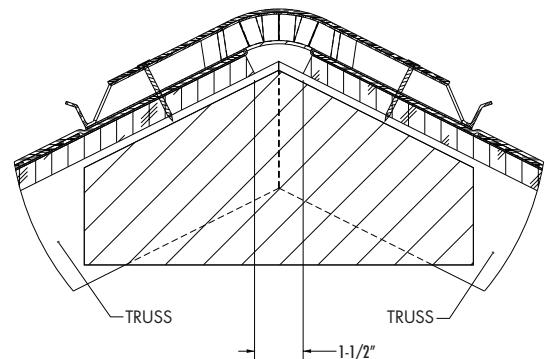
RIDGE BOARD TYPE CONSTRUCTION
